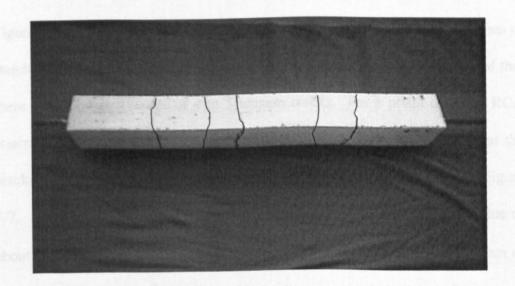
Typical tension cracks of a reinforcing bar bond test
